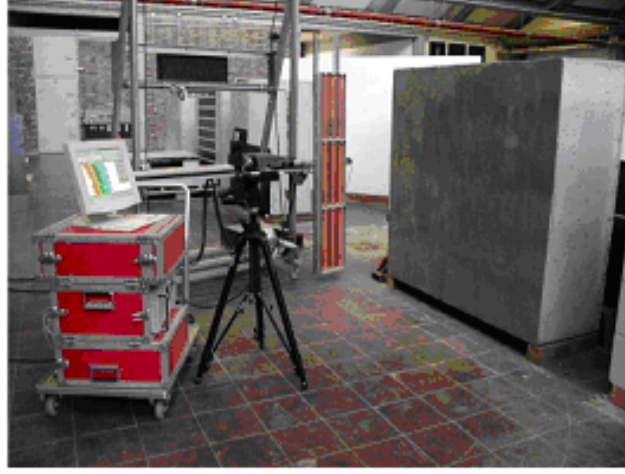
Laboratory set-up with IR heating unit, IR camera and investigated specimen.
